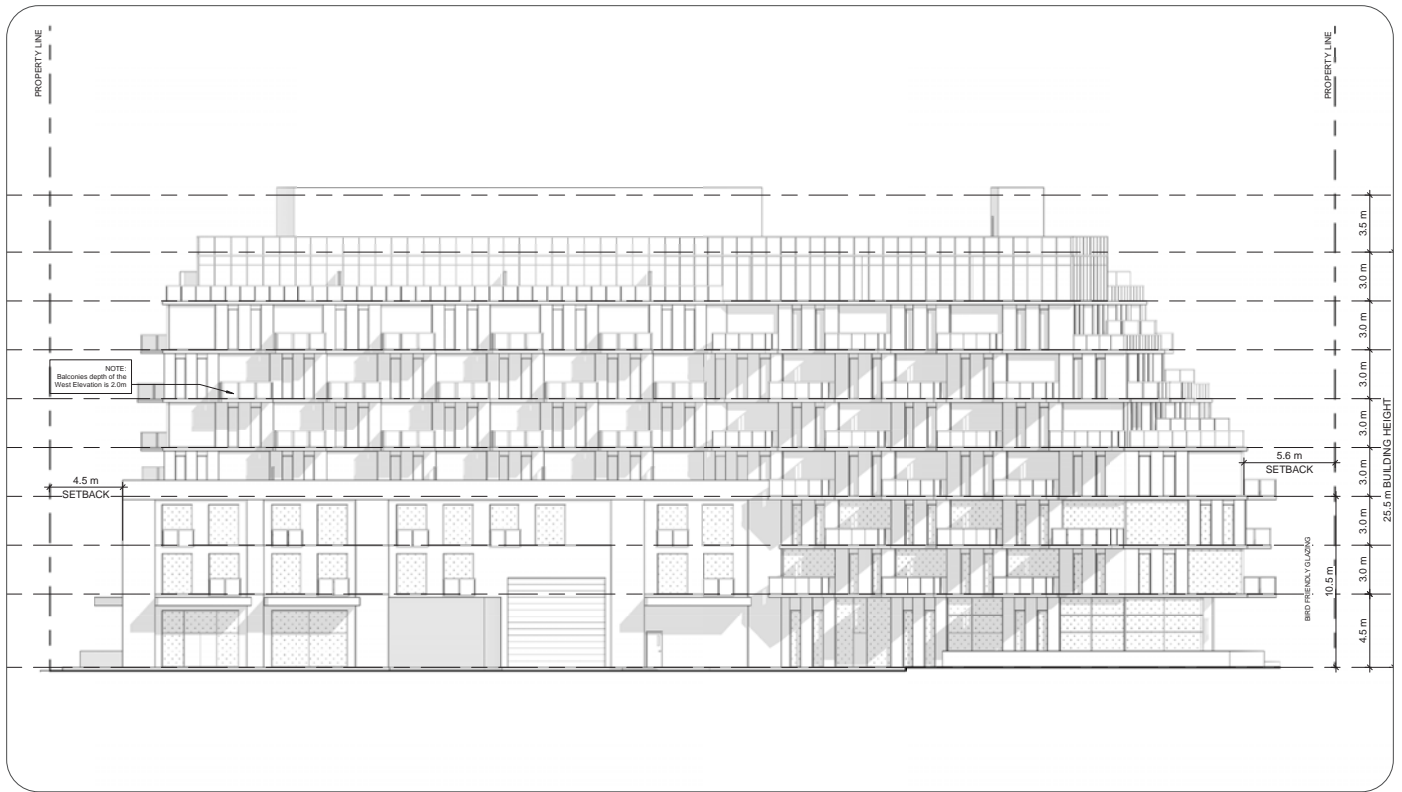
North Elevation, prepared by KFA Architects + Partners Inc.
